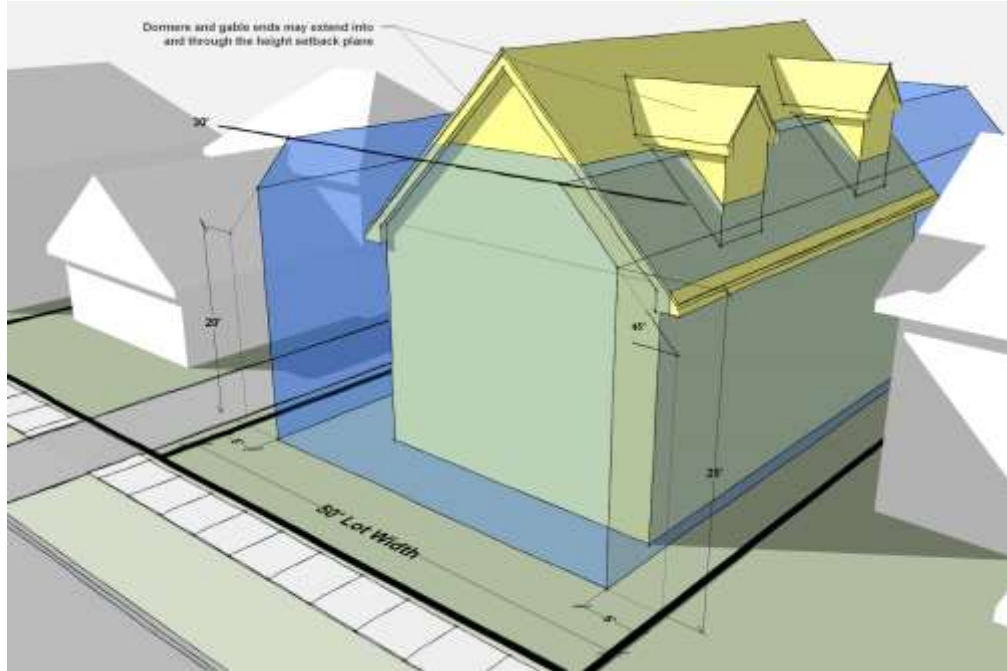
BUILDING HEIGHT SETBACK PLANE
